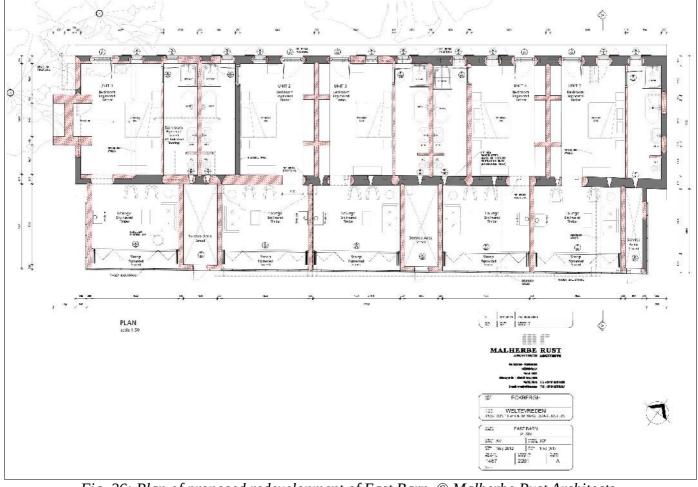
Plan of proposed redevelopment of East Barn. © Malherbe Rust Architects
